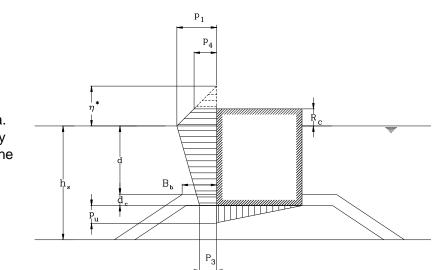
Occurring waves at construction (H. Outeraci, 1999)
